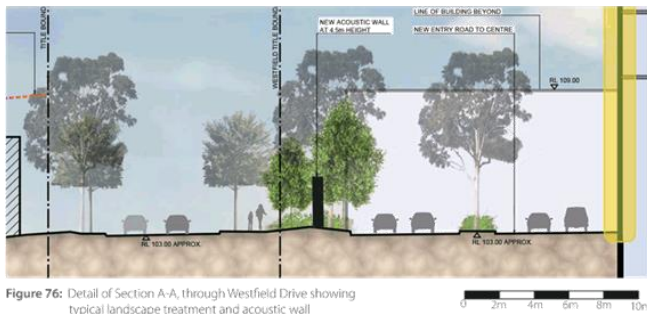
Detail of Section A-A, through Westfield Drive showing typical landscape treatment and acoustic wall
